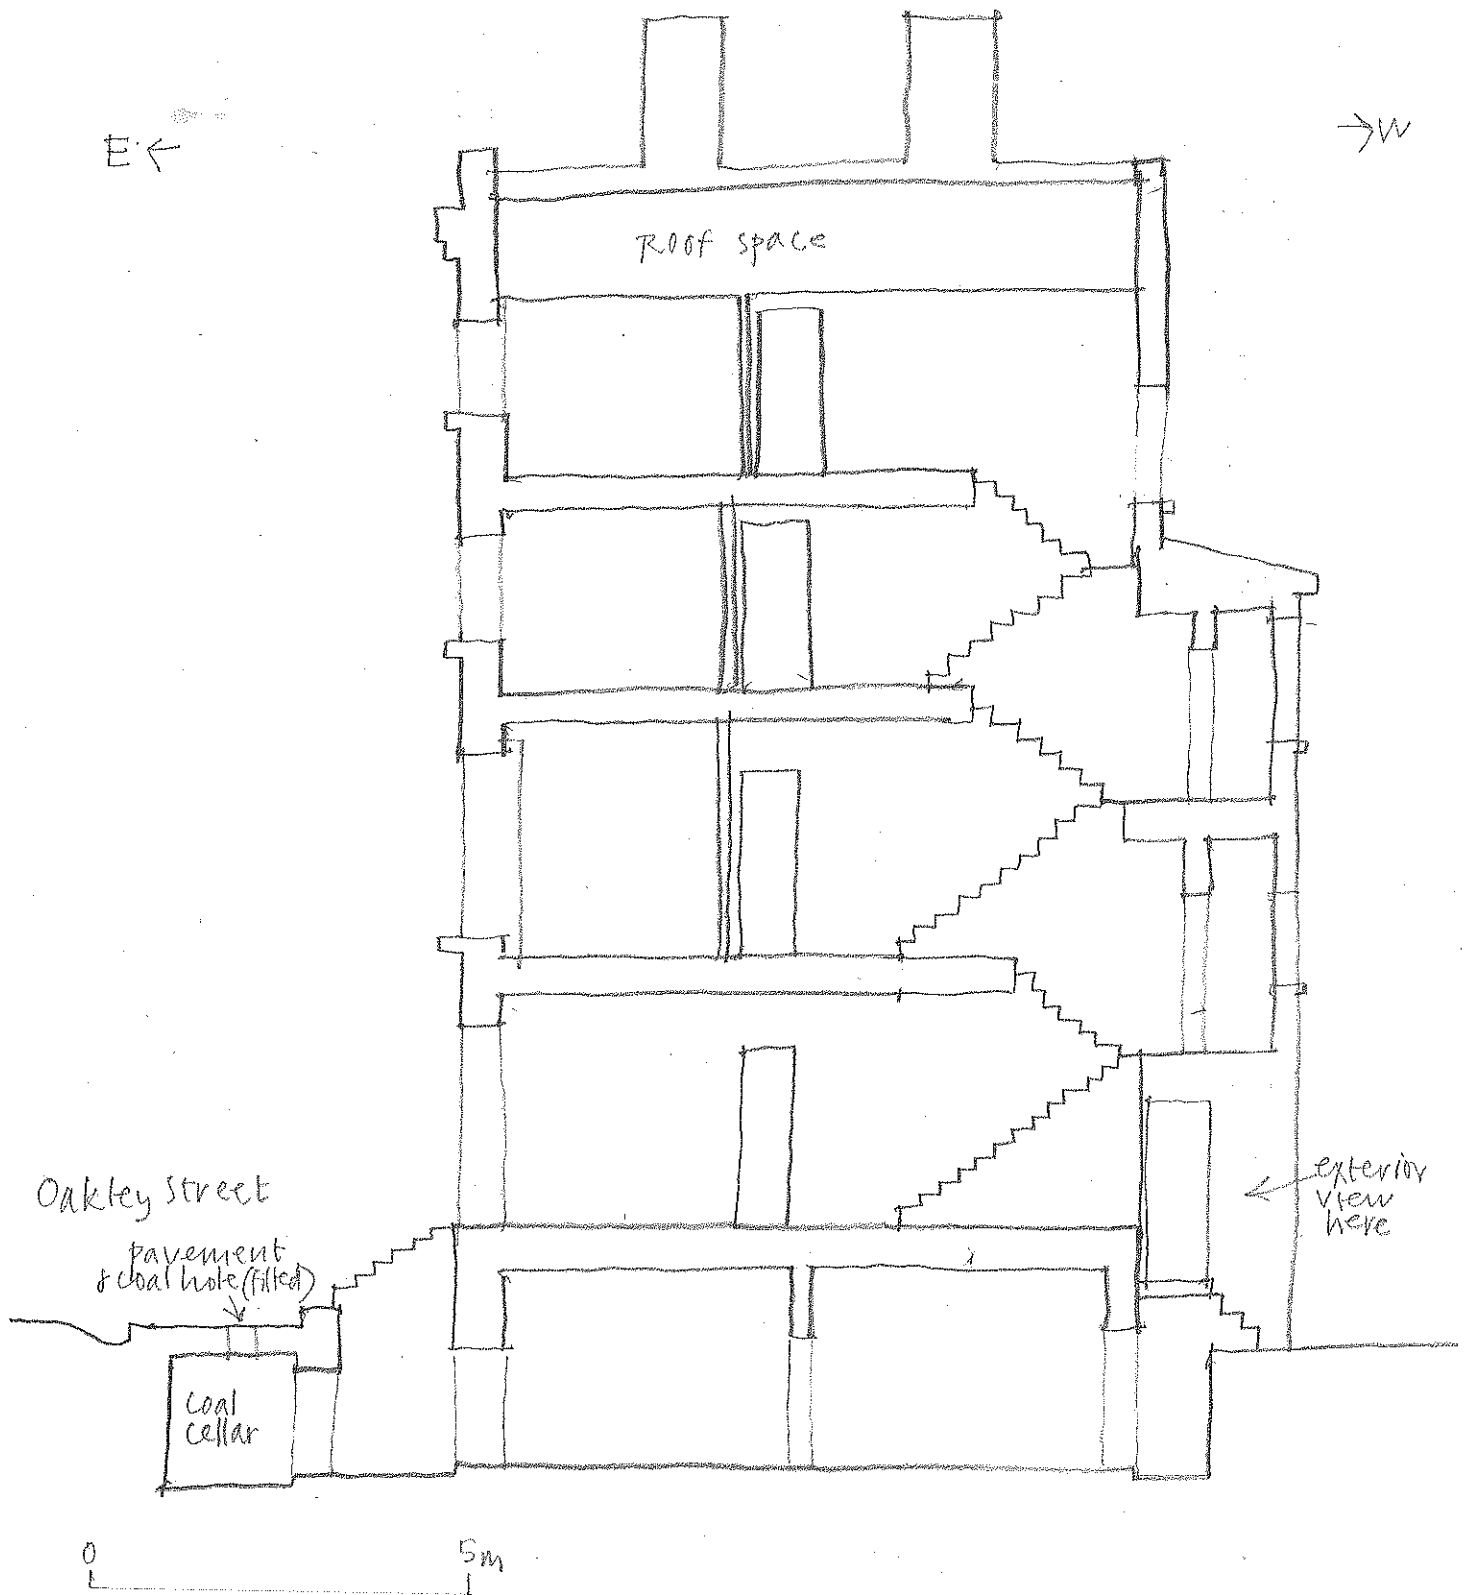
Sketch section through No 102 Oakley Street from east to west, looking south (1:100).
